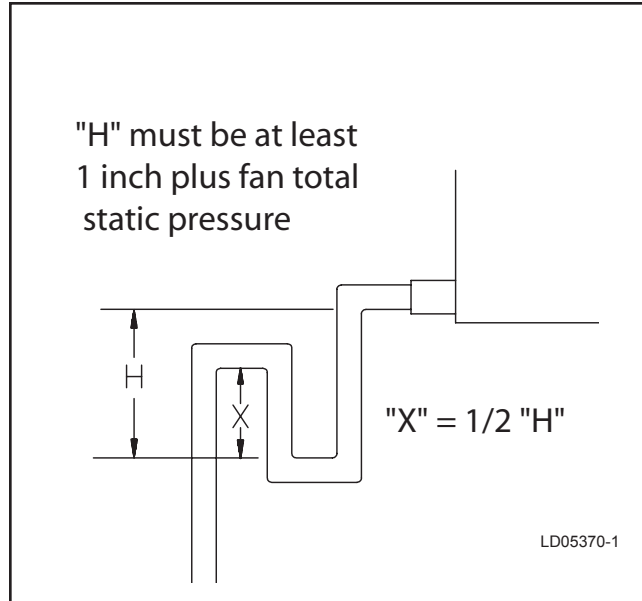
TRAP DETAIL FOR DRAW THROUGH APPLICATION
